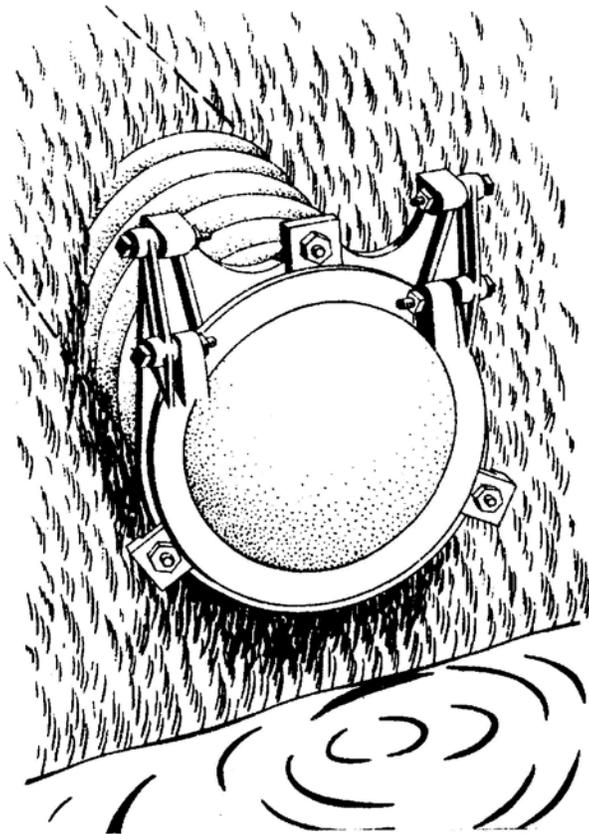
; B-5. Typical Exterior Levee Section For a Flood and Drain Gate
